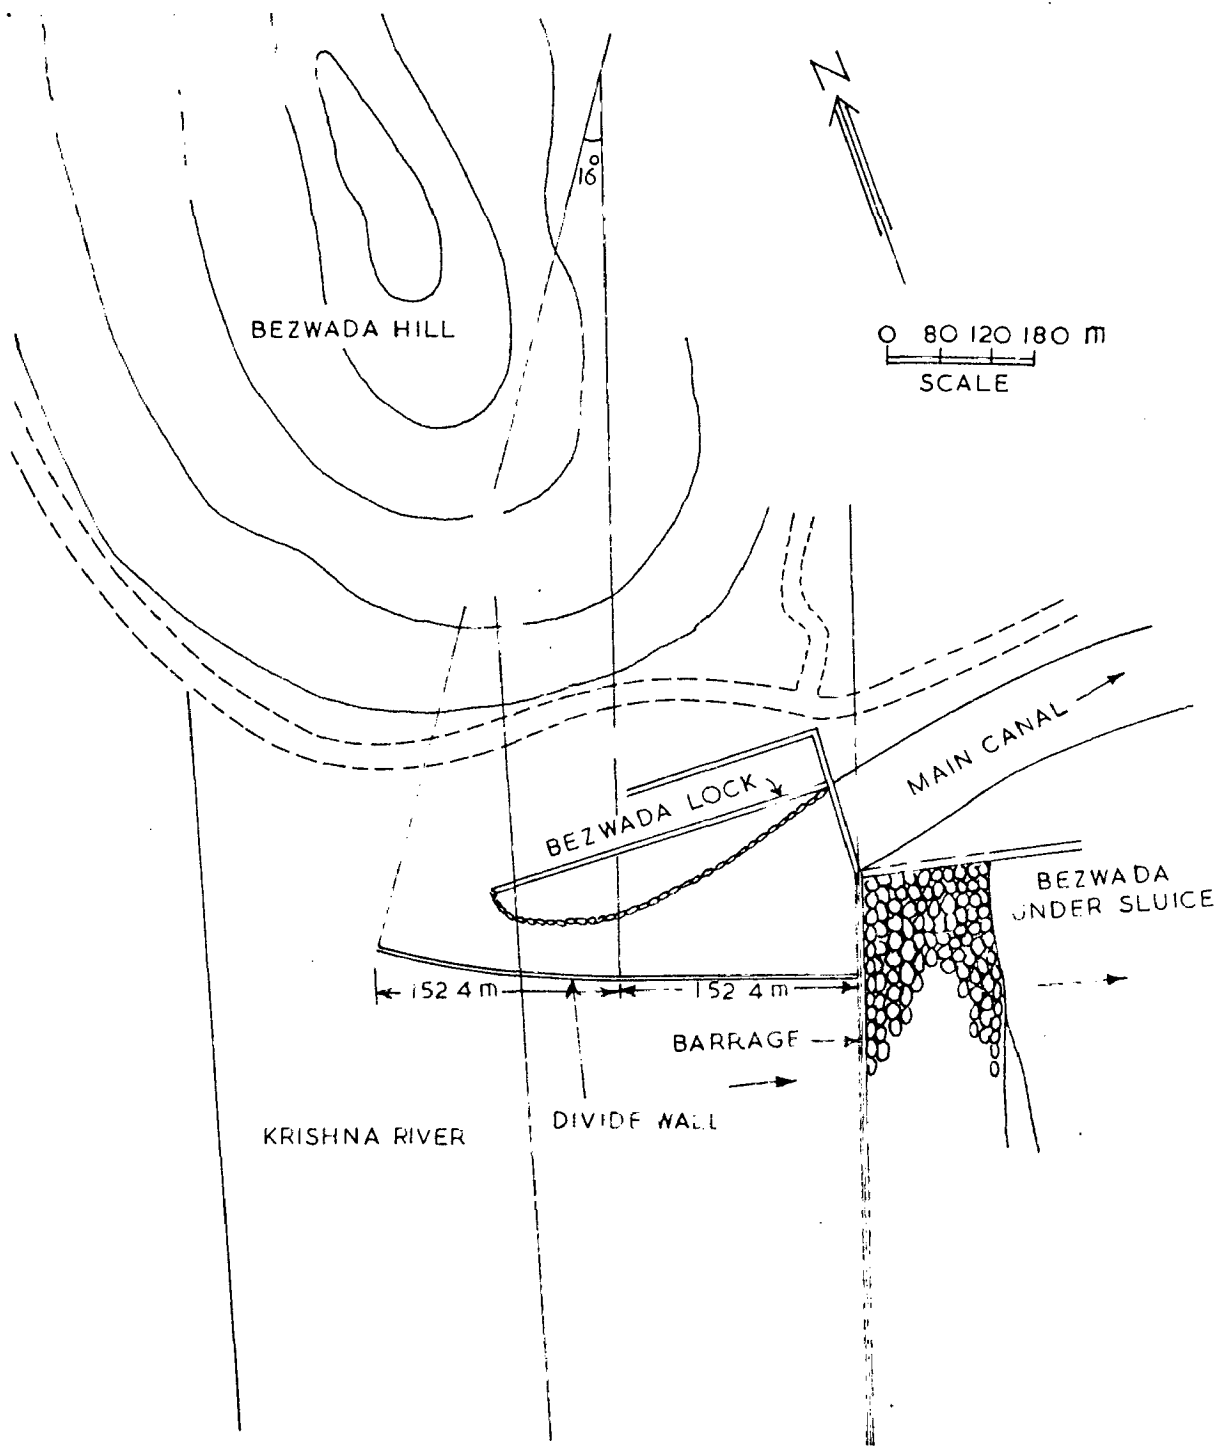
DETAIL CURVED DIVIDE WALL OF KRISHNA BARRAGE .
